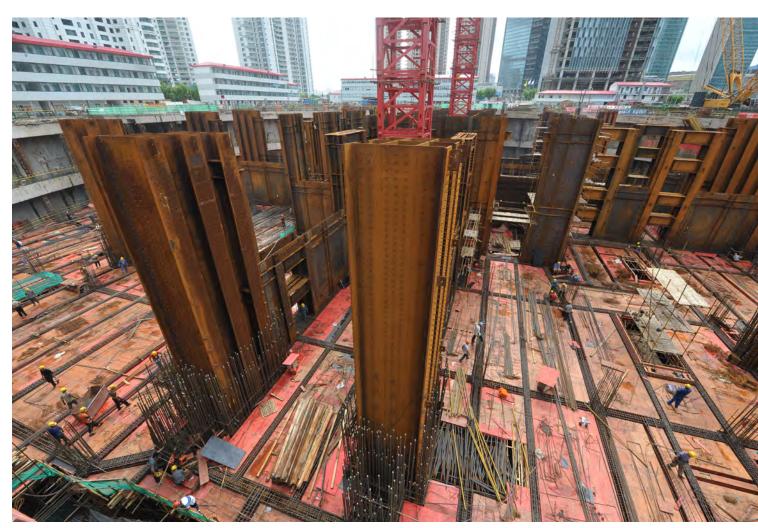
Steel - concrete composite shear wall (Source: Shanghai Construction Group) 图5.9. 钢板混凝土组合剪力墙 (来源: 上海建工集团)
